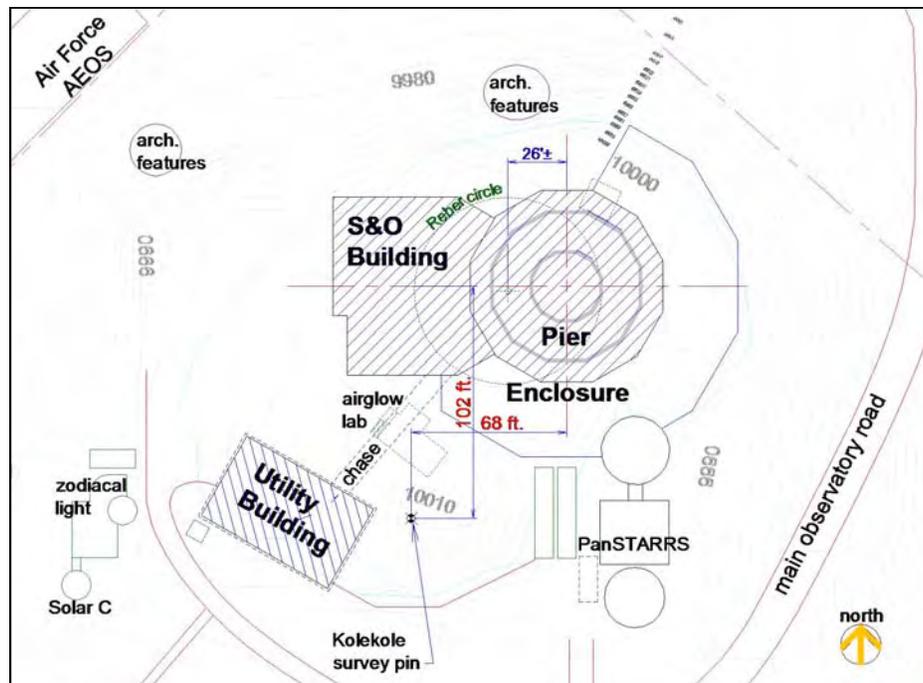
Site Layout of Proposed ATST Project at the Reber Circle Site.
